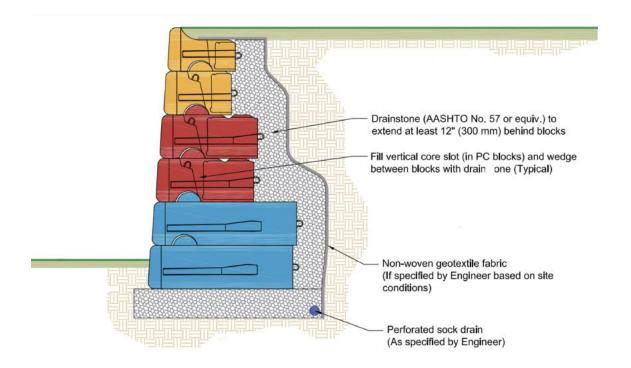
Use of non-woven geotextile separator for drainage column - 18 in (457 mm) high blocks
